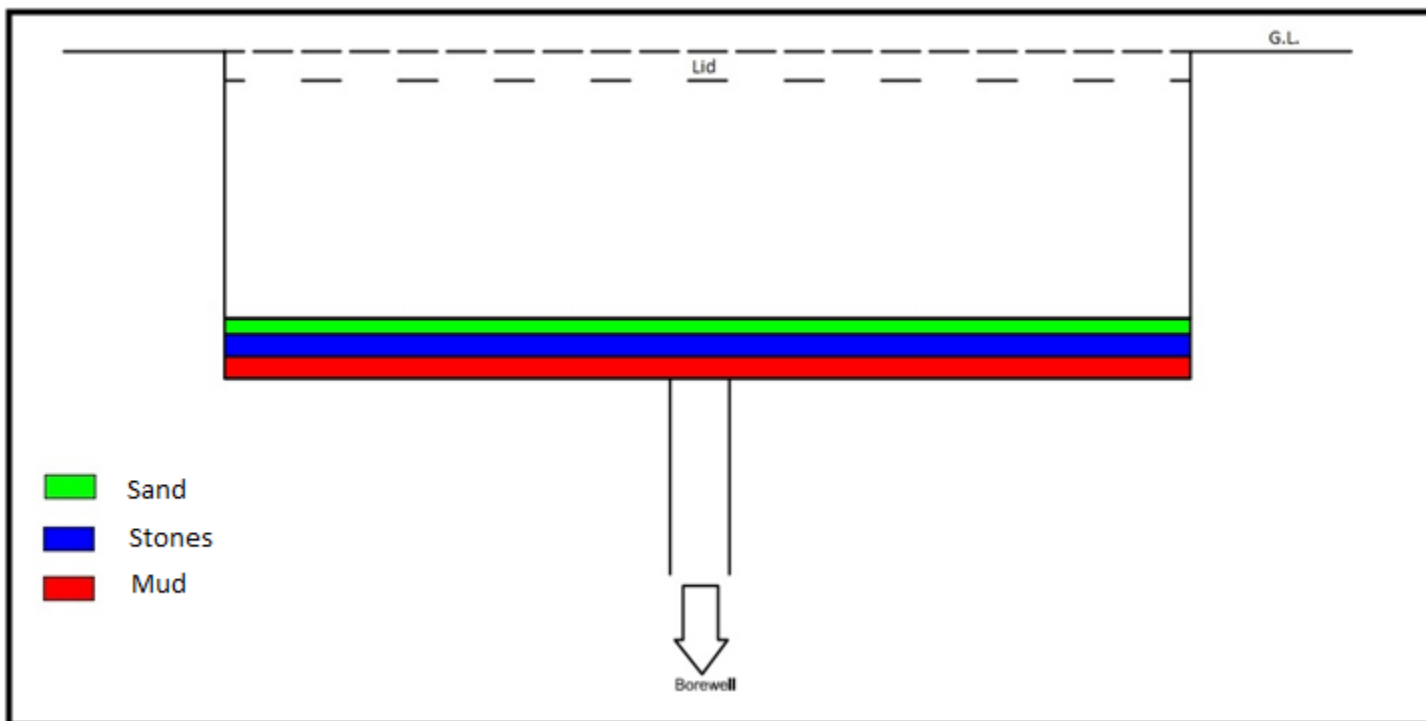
Typical layout of the underground water tank for RH (boring method)
